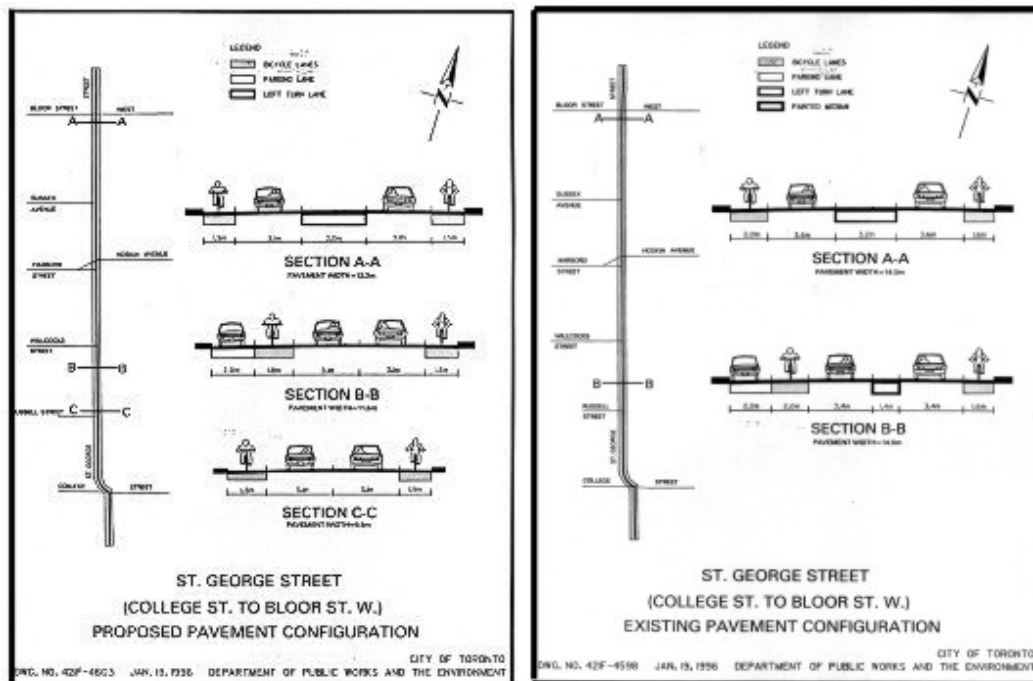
St. George Street Road Diet Cross Sections (Reference 12)
